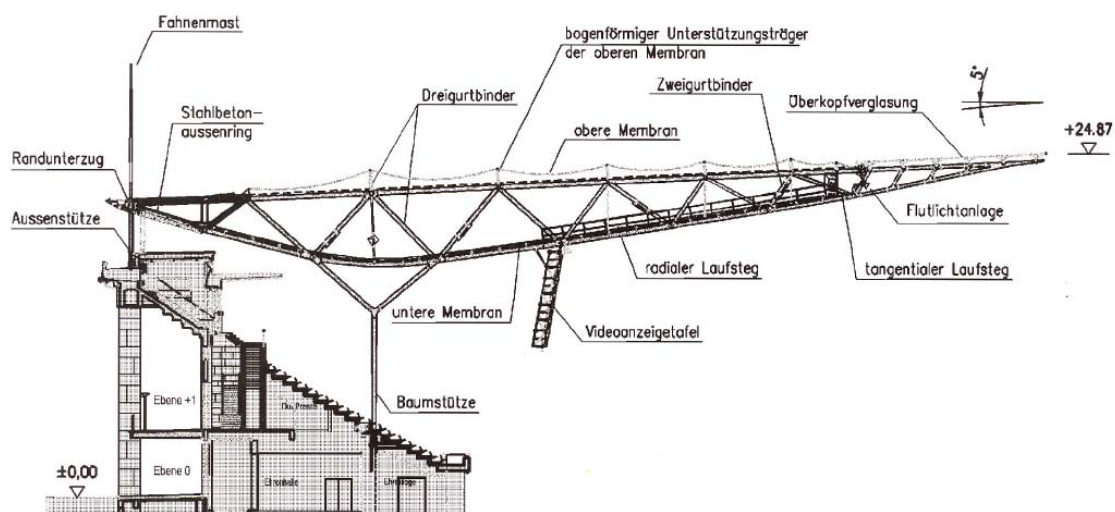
Cross section of the roof at the Olympic Stadium Berlin, Germany (explanation in German) [74]
